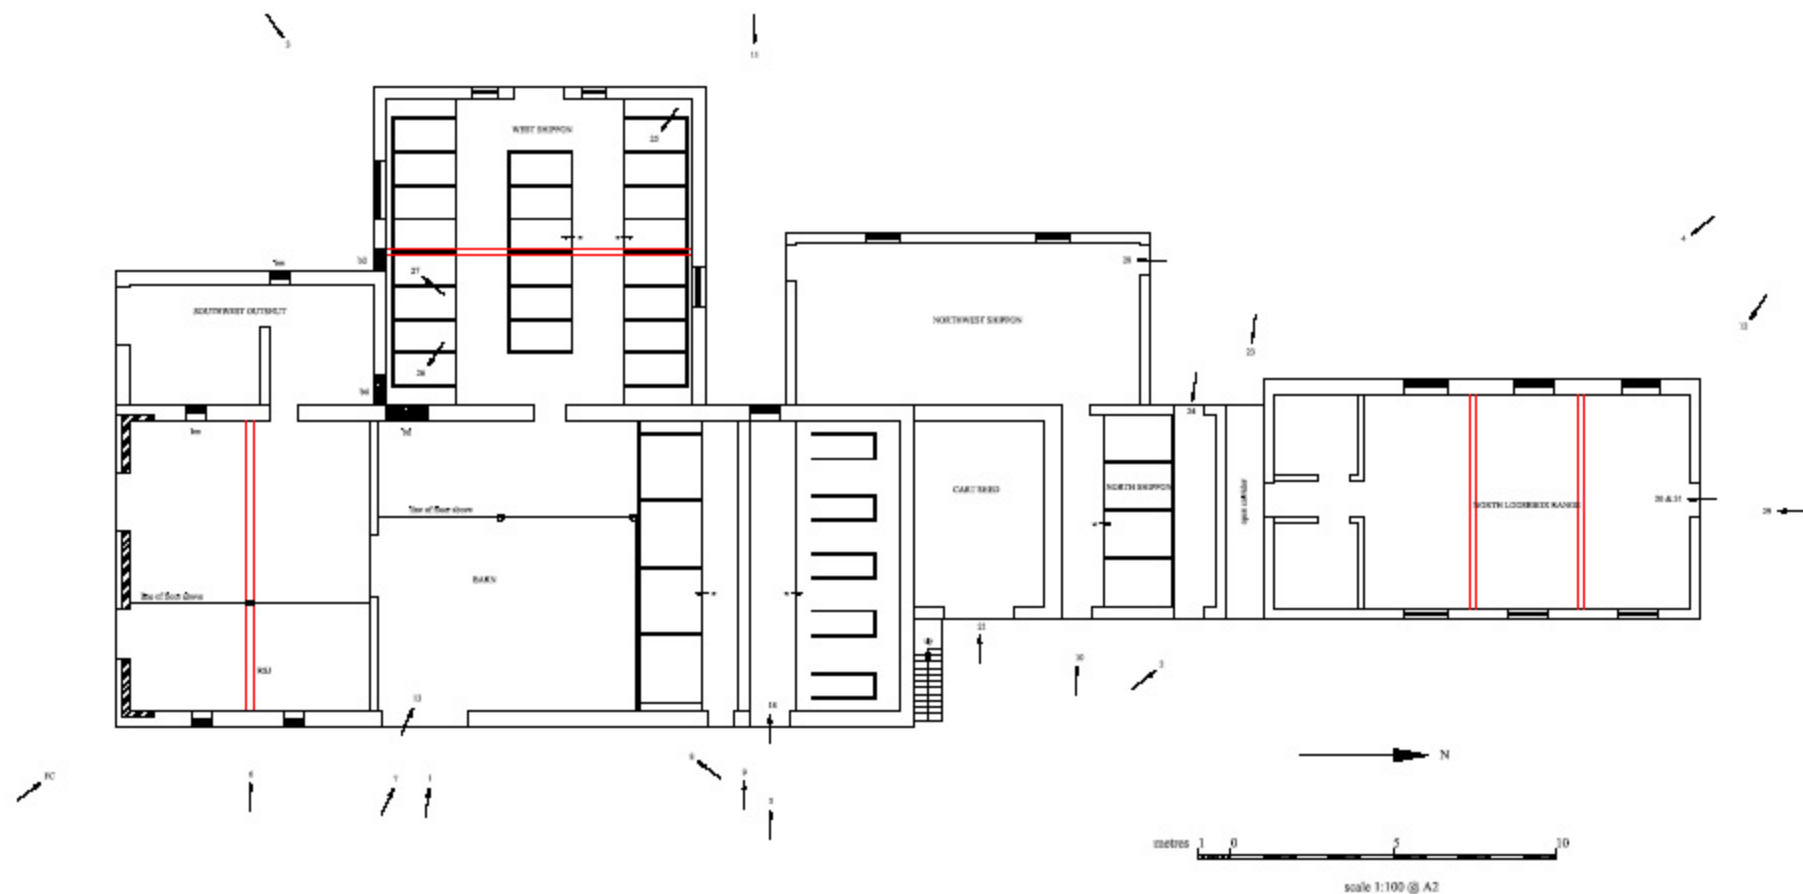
Ground Floor Photo Plan (Nos. refer to plate nos. in report)
